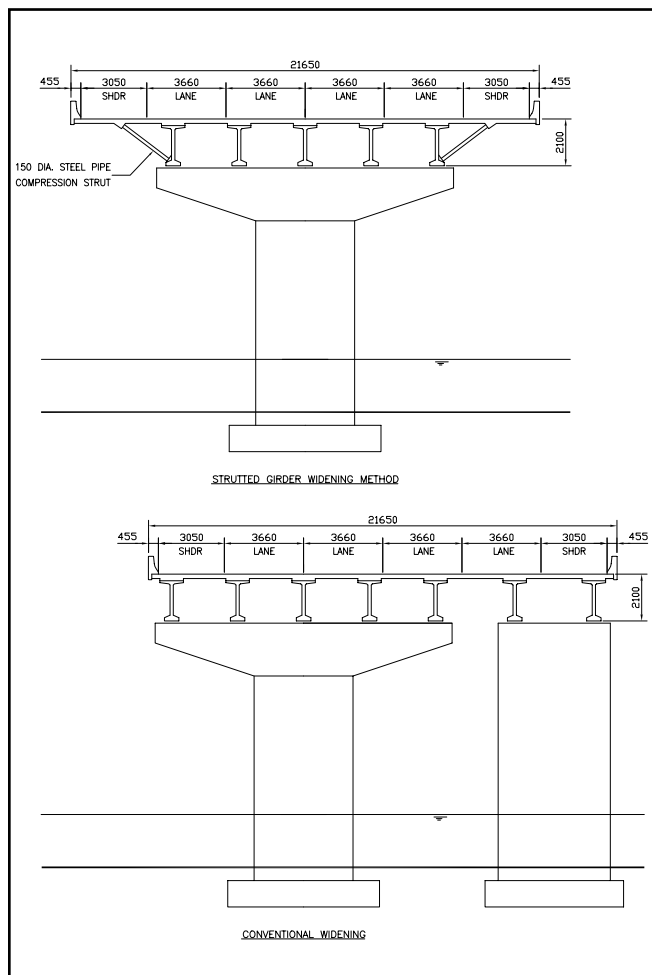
Strutted girder widening method versus conventional widening of a bridge.
